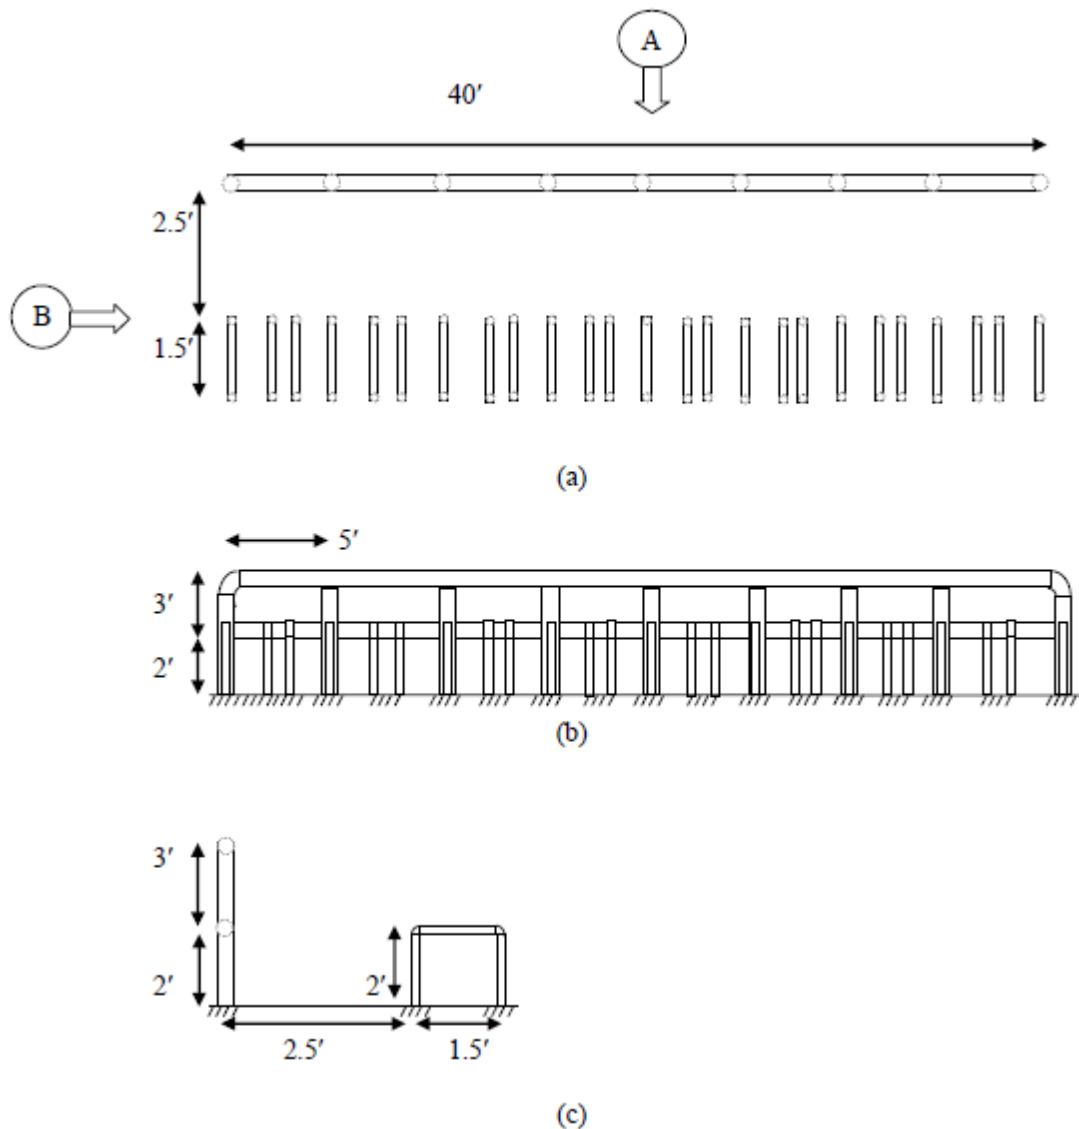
Proposed structure for the exercise regimen. (a) Plan of the structure (b) Elevation (view from A) (c) Elevation (view from B)
